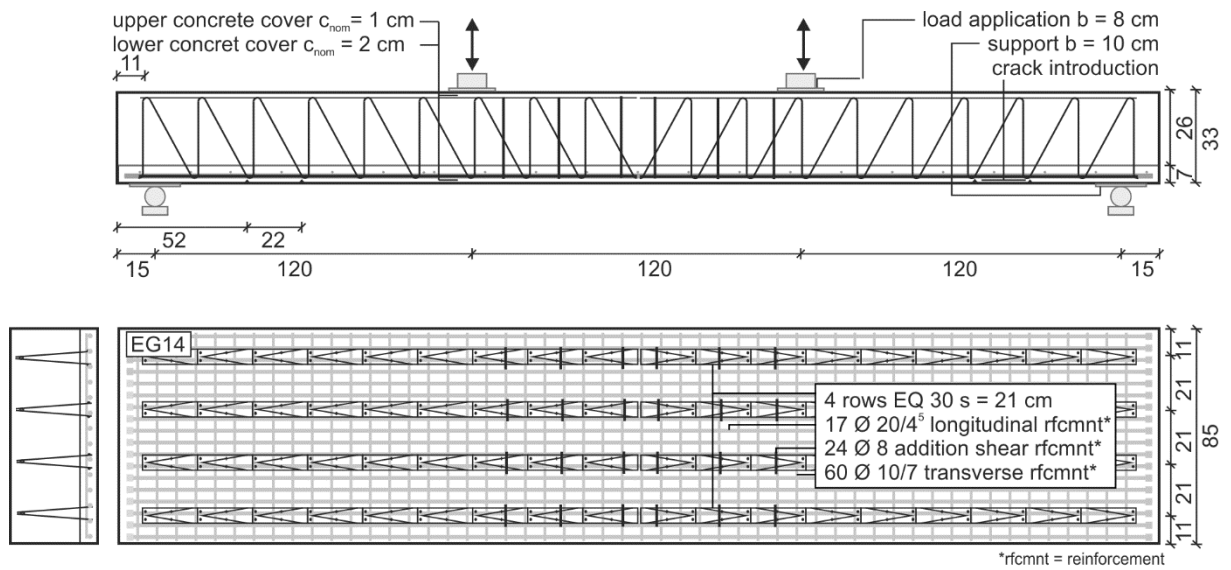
Reinforcement and formwork detail of specimens EG10, EG11, EG12 and EG14
